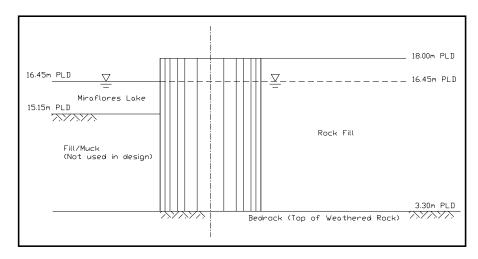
Typical cross-section for the non Tie-Up section for the long term condition
